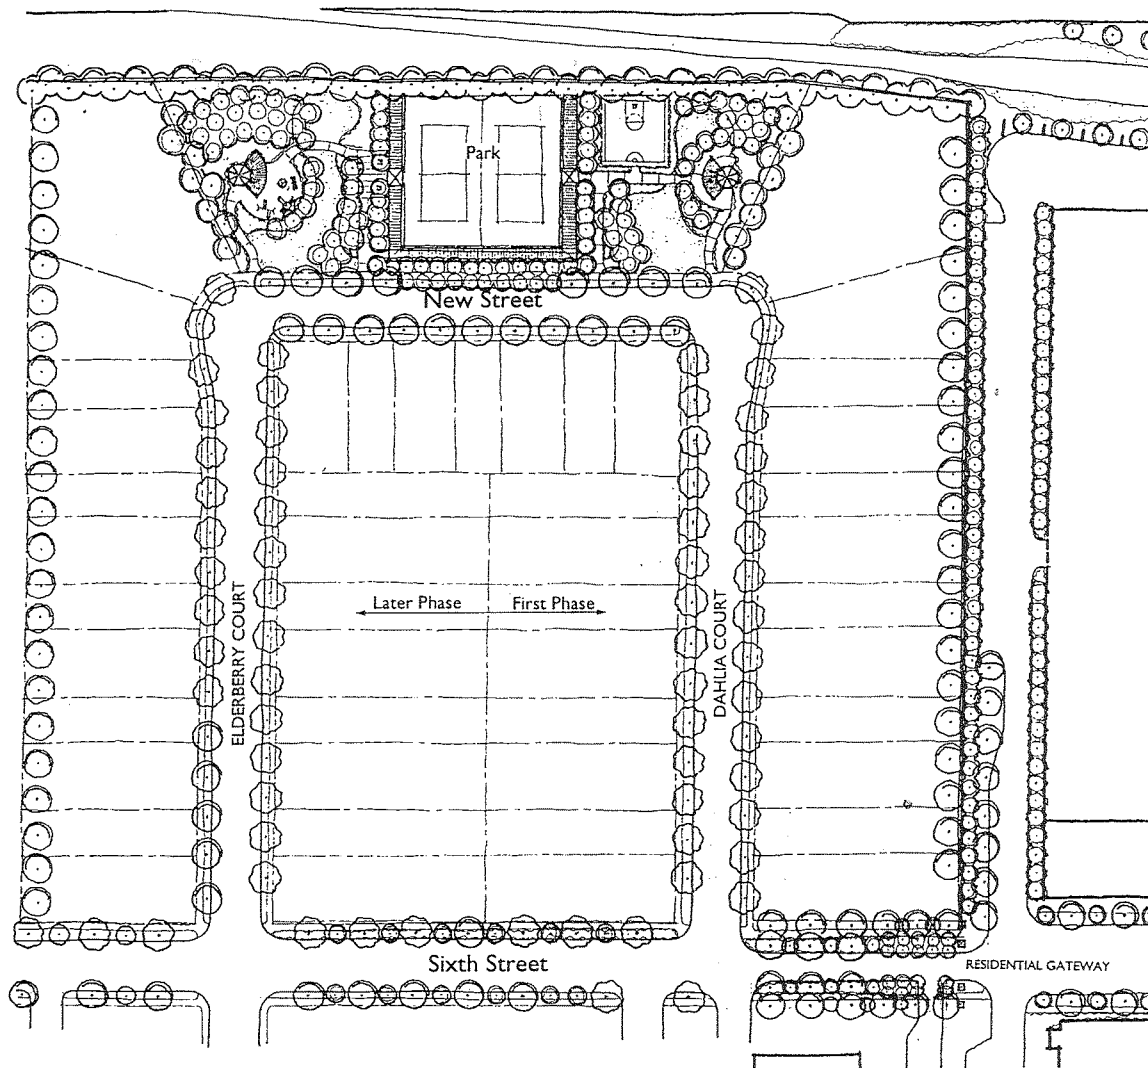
, Residential District Illustrative Plan. The Residential District will provide home ownership opportunities in an environment with safe, treelined streets and new recreational facilities. This illustrative Plan also shows one possible lay-out, and it shows how a mix of lot widths can be used to introduce housing diversity and a more interesting streetscape.
